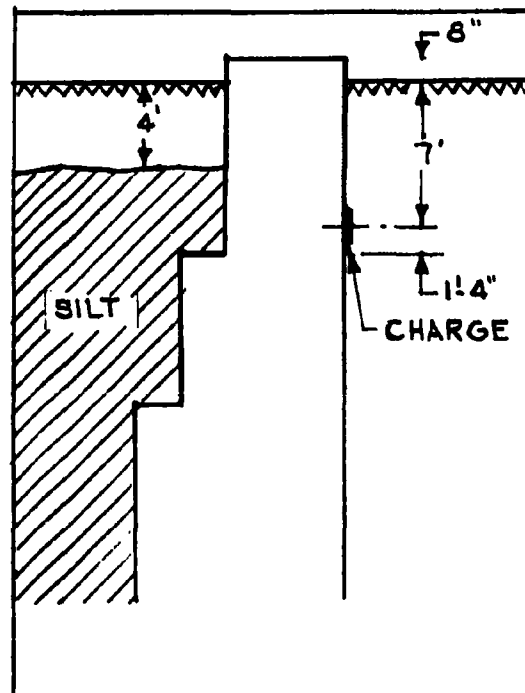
Forty-pound charge placed 7 feet under water at point where silt deposit behind wall was 4 feet from water surface failed to breach wall.
